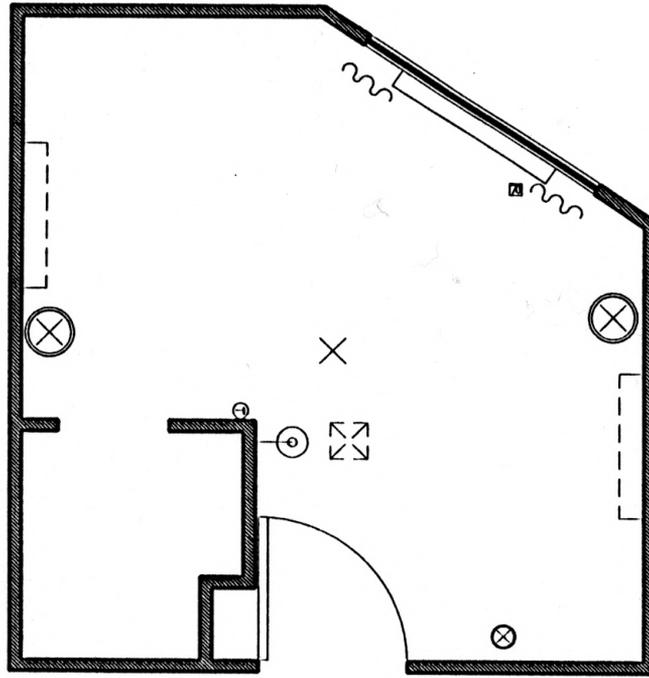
Plan of Skilled Care Residents' Room - Site 1.
